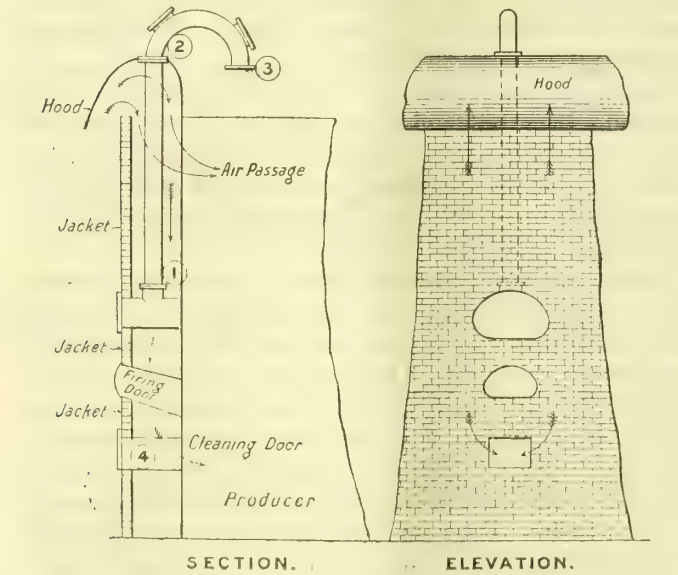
SUGGESTED METHOD OF HEATING MOUTHPIECE AND AIR FOR COMBUSTION.
